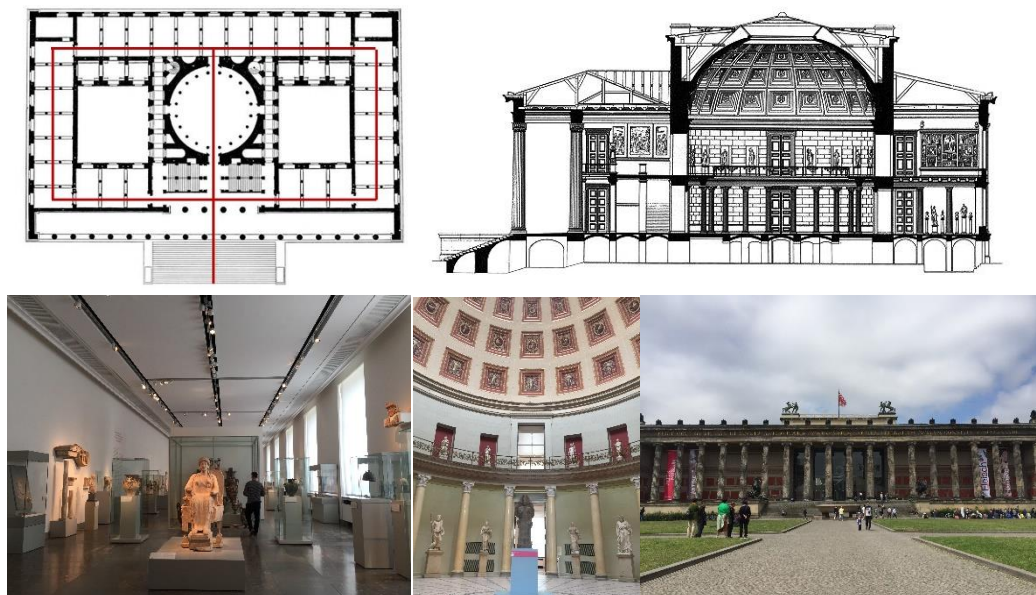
Altes Museum*, Karl Friedrich Schinkel, Berlin, 1823-1930, plan, linear circulation scheme, section and rotunda (Archiweb, 2024); *Altes Museum's* exhibition space and façade, photographs (Canbakal Ataoğlu, 2018)
